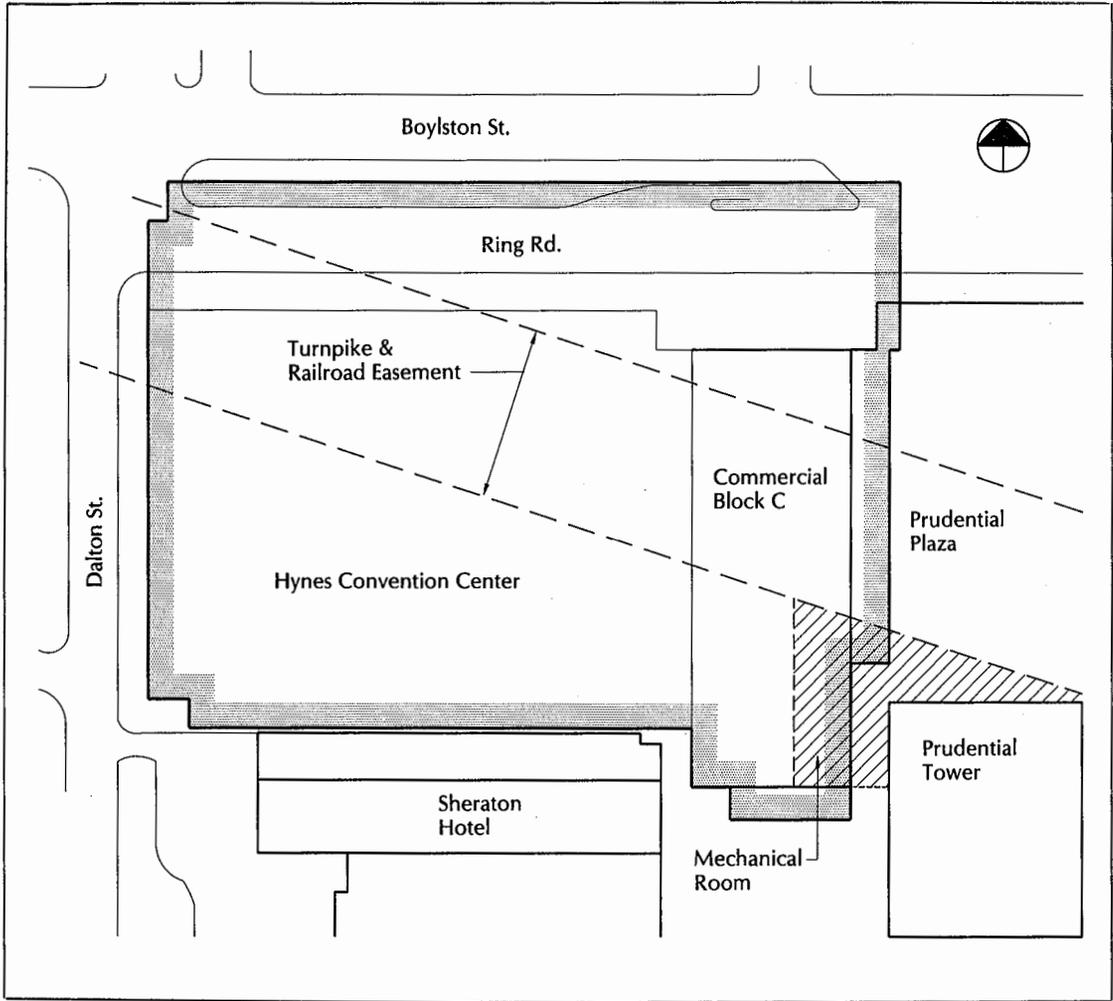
The site plan of the renovated Hynes Convention Center.
